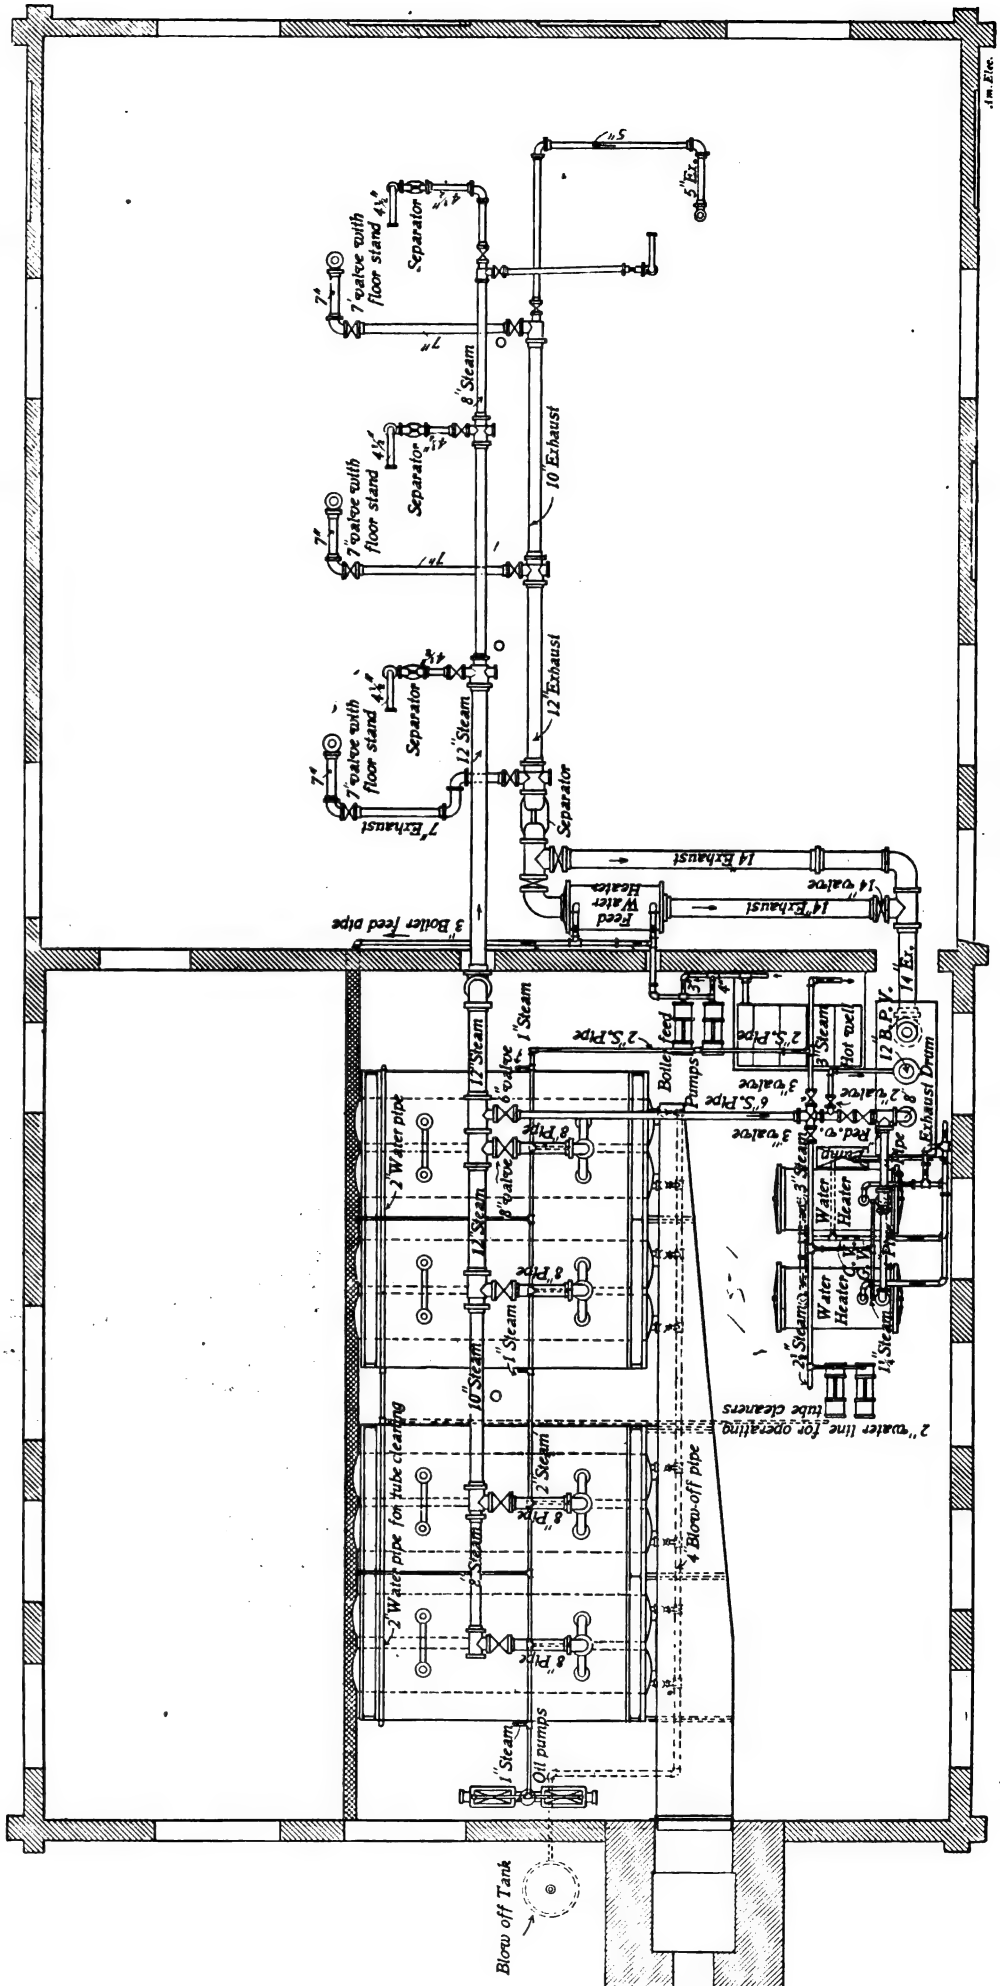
PLAN VIEW OF STEAM AND WATER CONNECTIONS.
